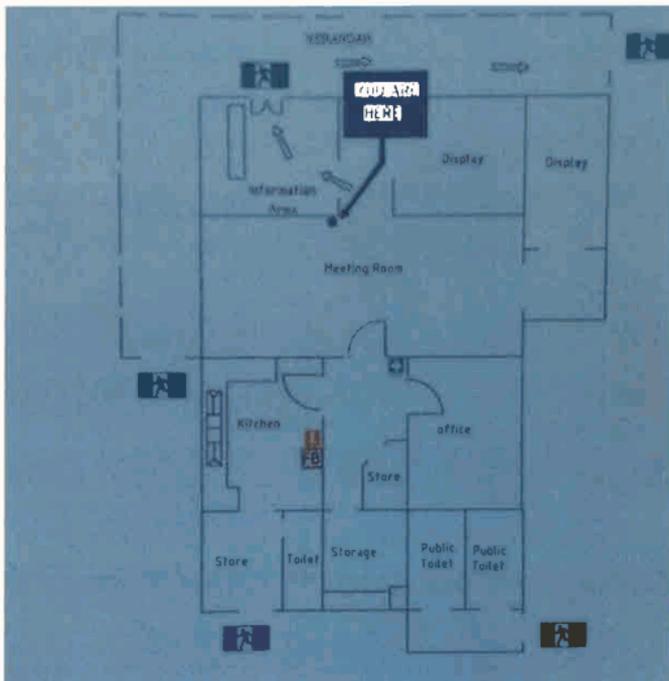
The floor plan showing the capacity for the central passage to serve both the existing and a substantial rear extension
